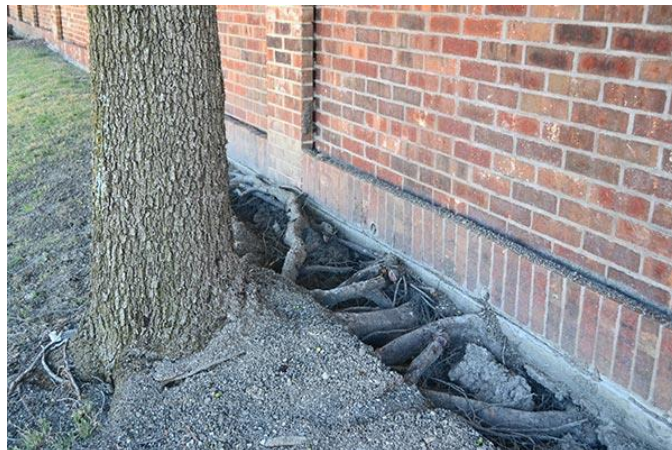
Tree roots growing under foundations (CNT Foundations, 2020)
